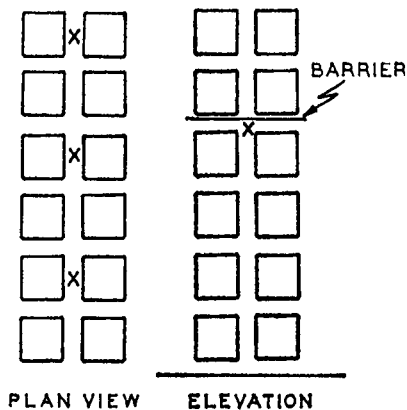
(a) In-Rack Sprinkler Arrangement, Class I Commodity, Maximum Height of Storage 25 Ft (7.62 m) to 30 Ft (9.15 m).
